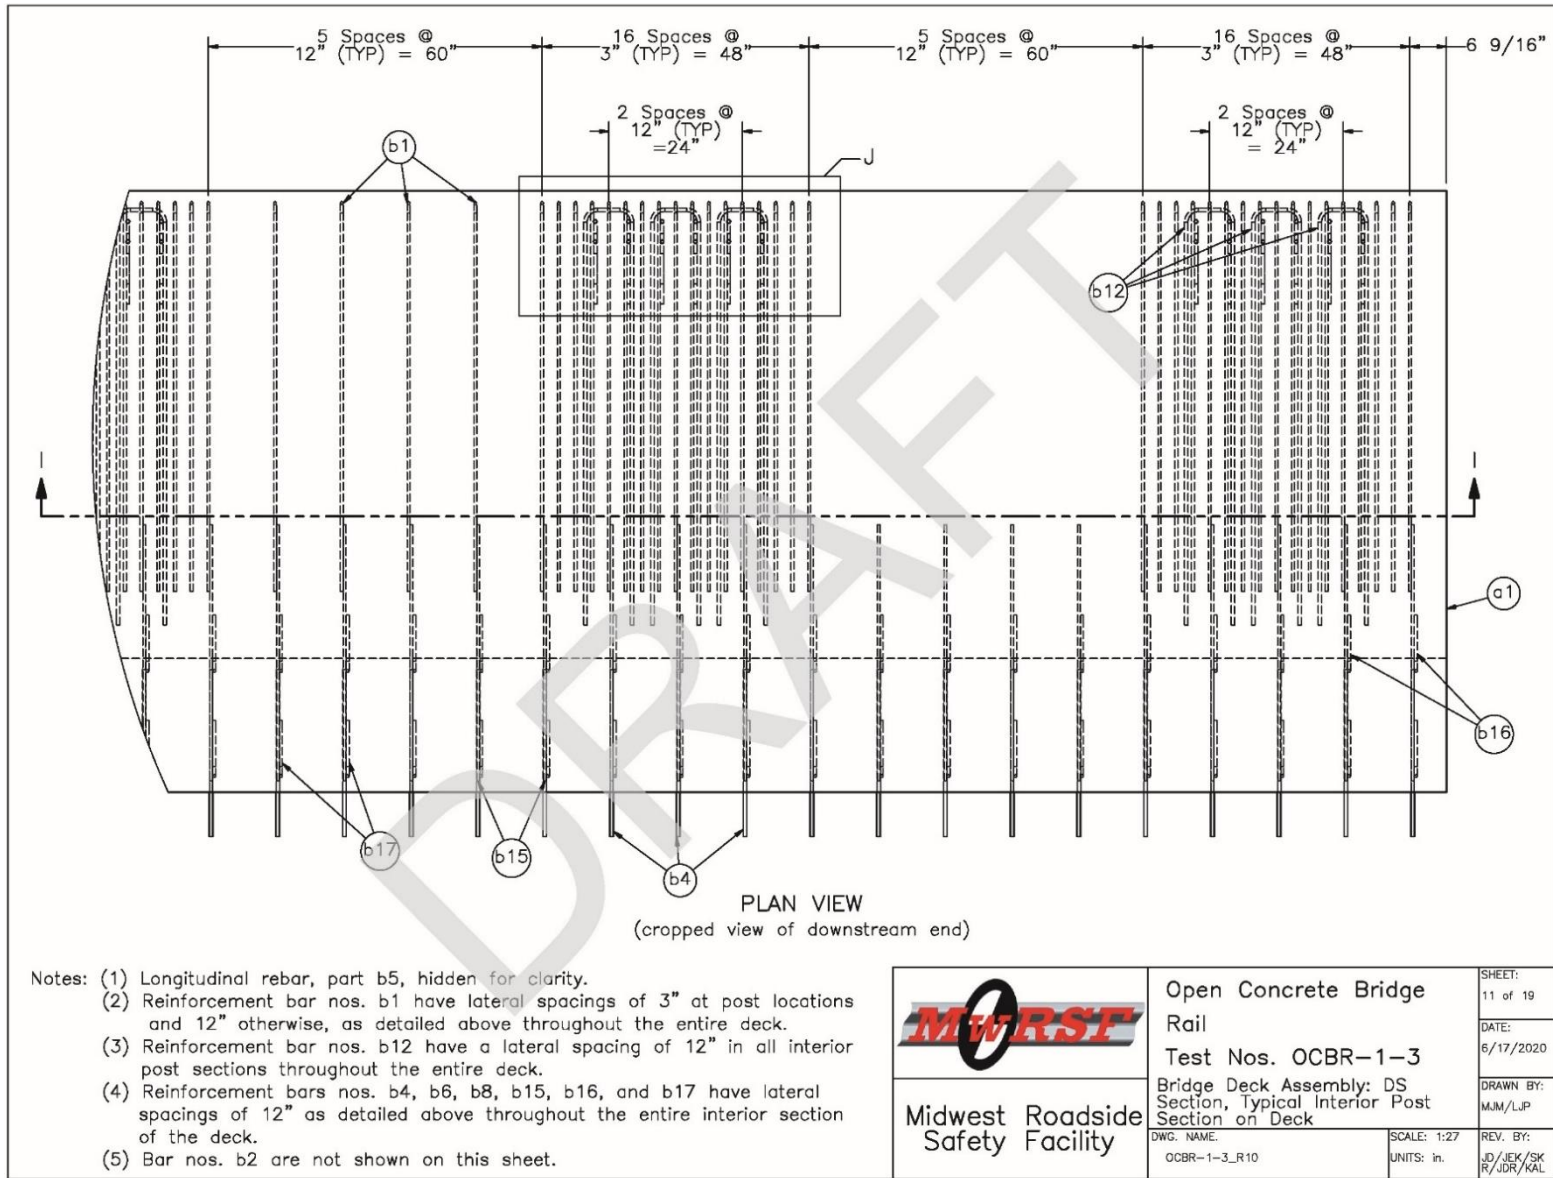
Open Concrete Bridge Interior Post on Bridge Deck and Tarmac Assembly
